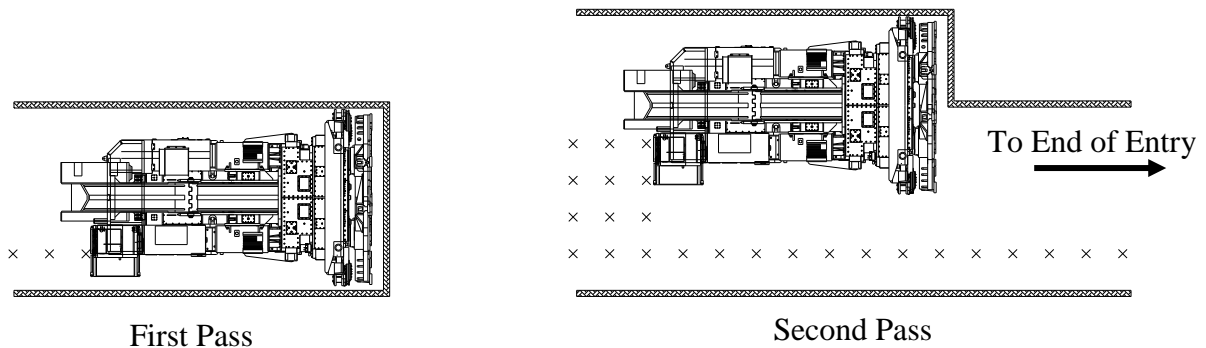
Proposed bolting method on right side of conveyor only. 'X's represent analyzed bolt installation locations. The same pattern is used for the 'Bolt while Mining – Right Side of Conveyor Only', 'Bolt while Paused – Single Bolt on Right Side of Conveyor Only', and 'Bolt while Paused – Two Bolts at a Time on Right Side of Conveyor Only' analyzed procedures.
